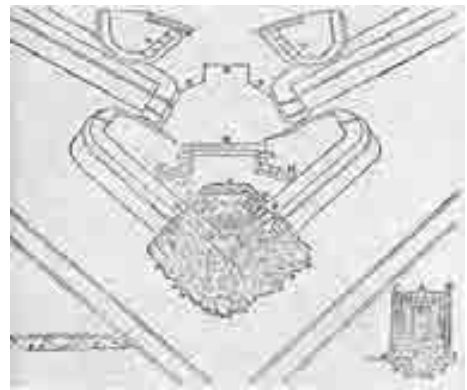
Nicosia's city walls, detail plan of one bastion.
